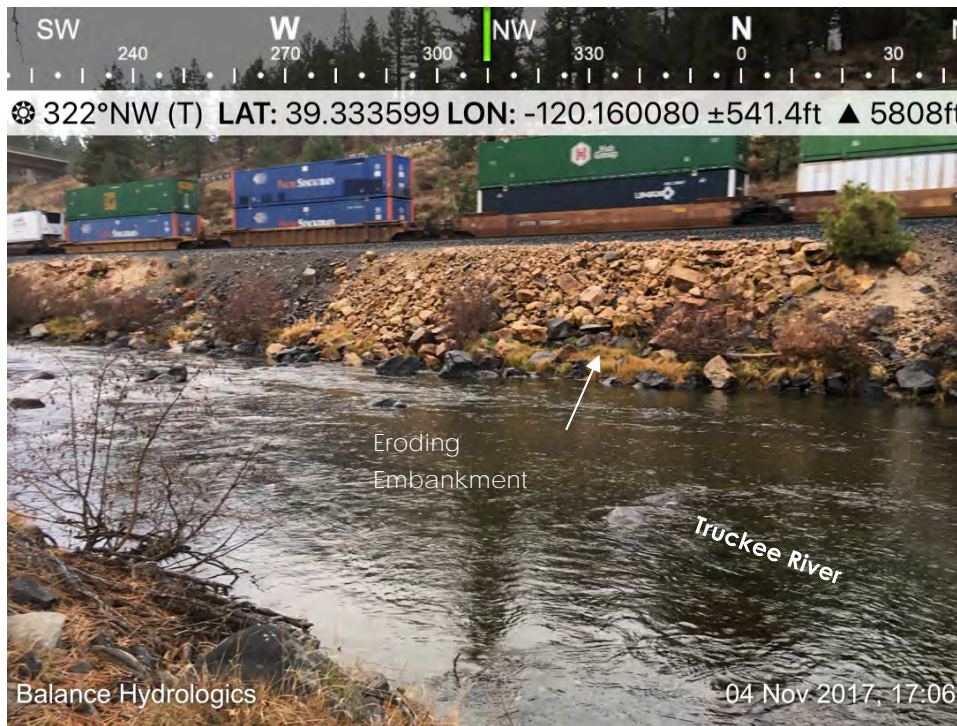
Active Erosion Along the Railroad. Truckee River Tail Downstream of Legacy Trail Bridge.
